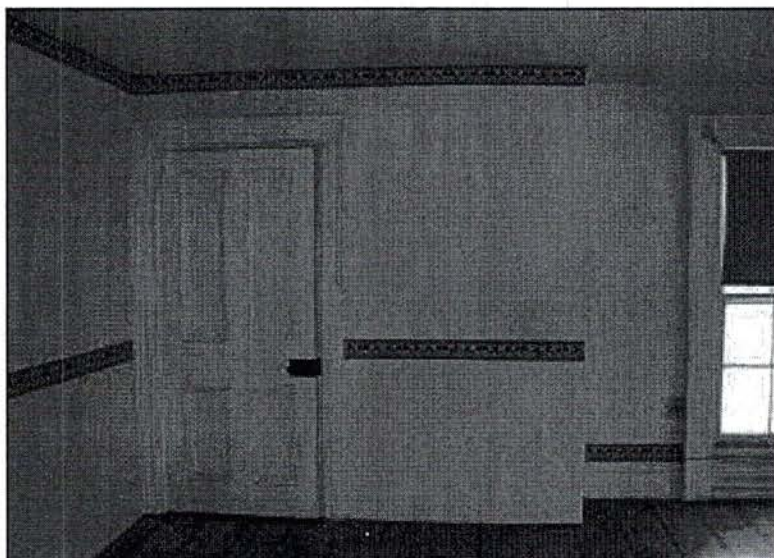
Closet on north wall of Room 200. This door retains original box lock. This closet door is missing a section of its molding on the right hand side.
